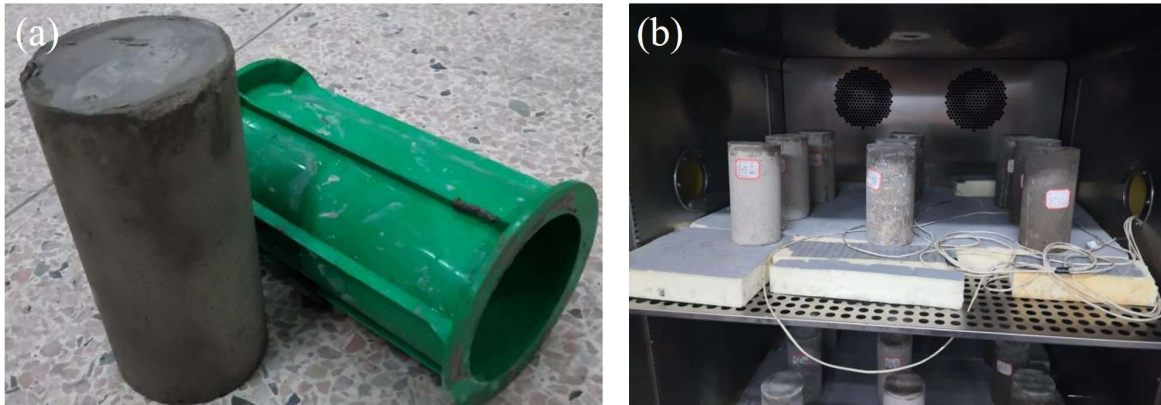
Cast specimens. (a) Samples in molds; (b) demolded samples.
